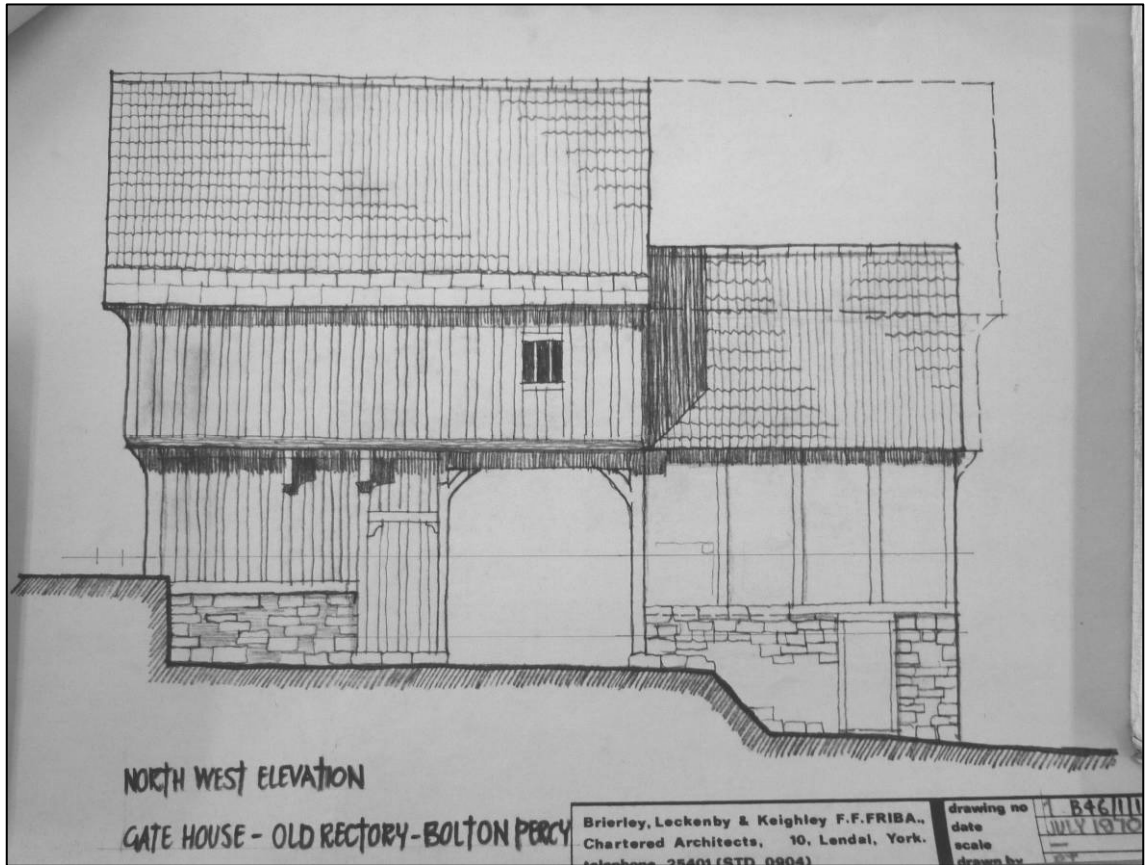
Brierley, Leckenby & Keighley's drawing of the north elevation of the gatehouse as existing, July 1970 (York City Archives B46/1 shelf O4F).
